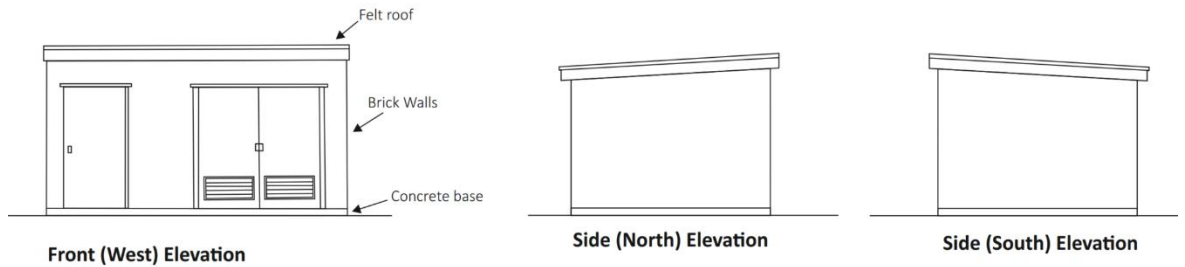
Proposed Elevations of Filter Press Structure © SLA Design
